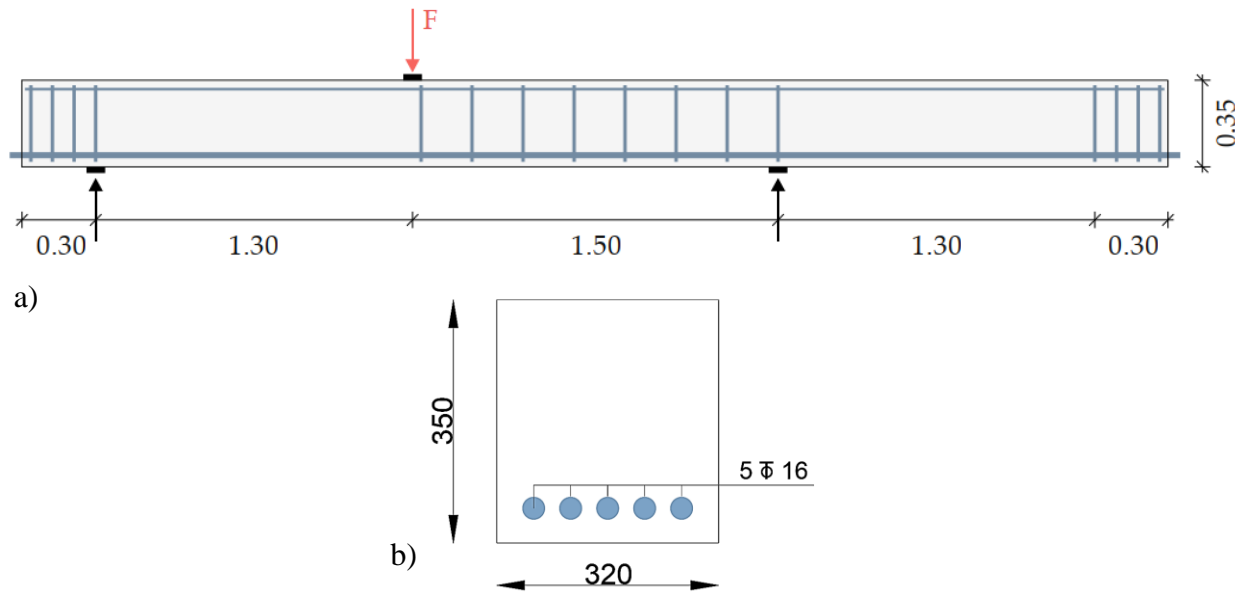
a) Section beam geometry (mm), b) Side view of beam (m) (Schmidt et al., 2021)
